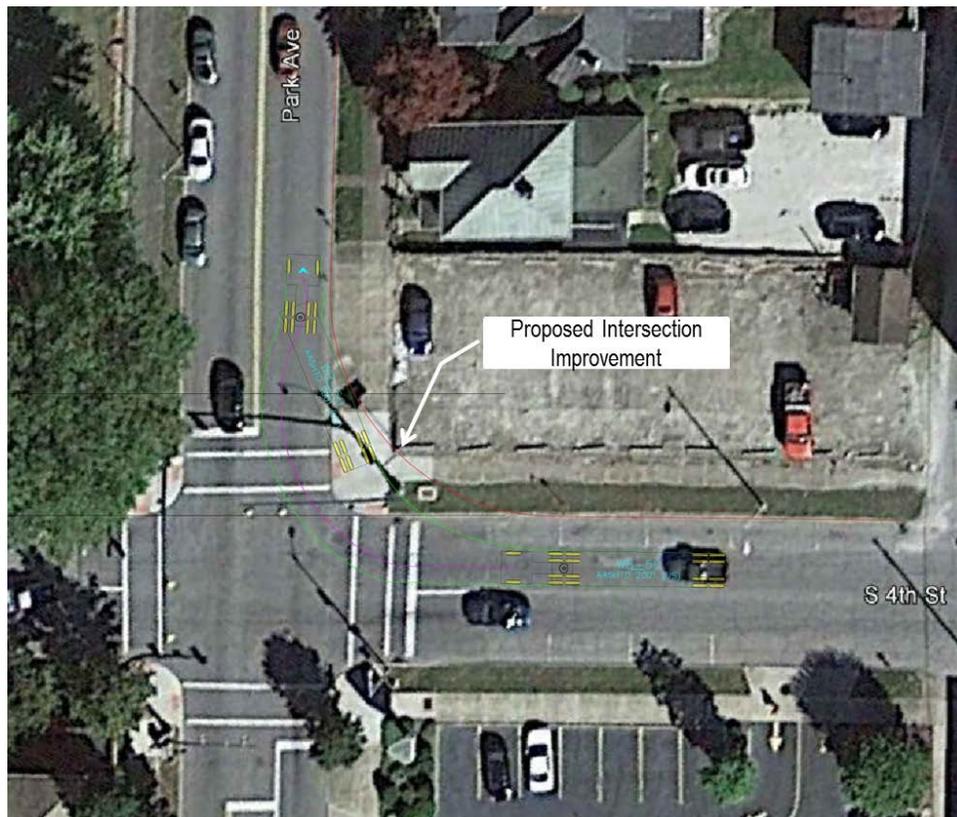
Recommended improvement for Park Ave. and 4th St. intersection
